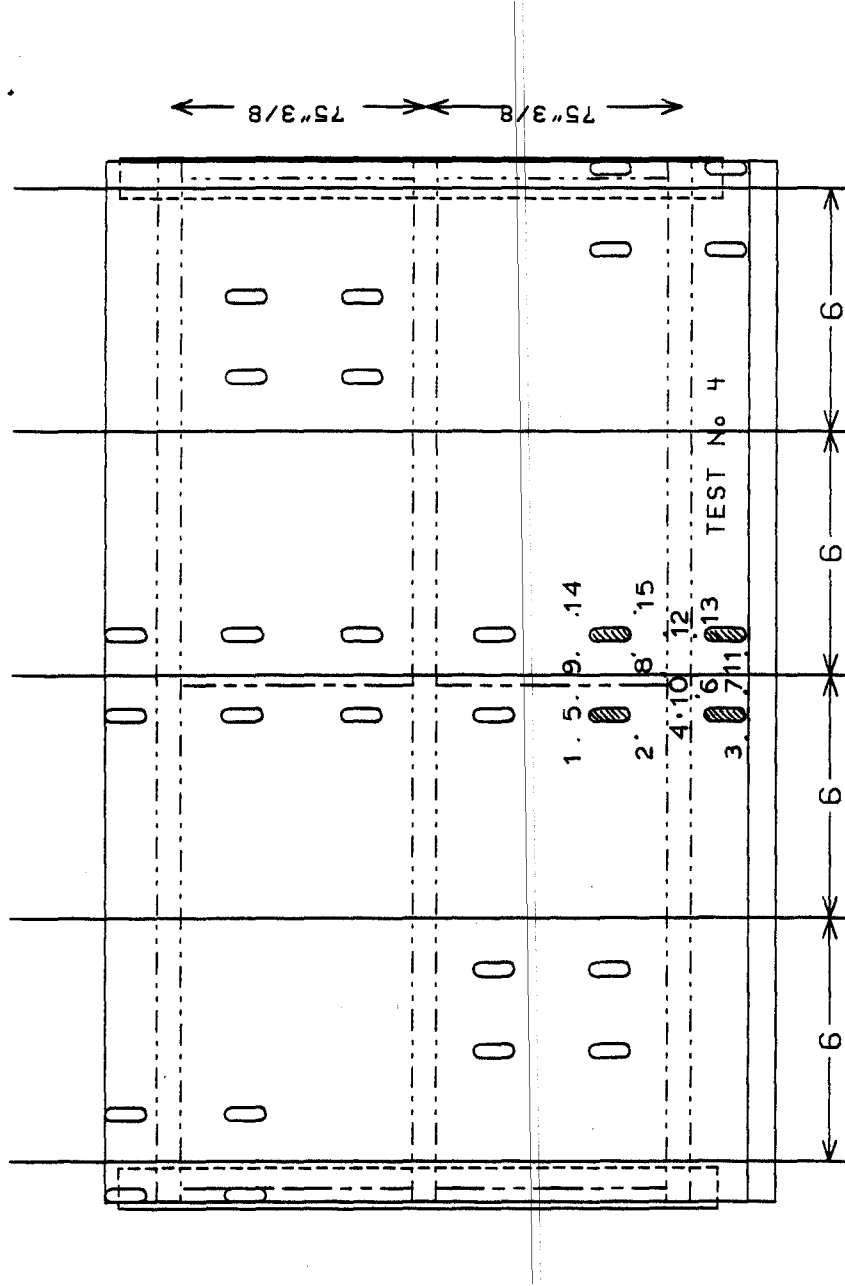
LVDT Locations (Second Bridge - Test No. 4)
